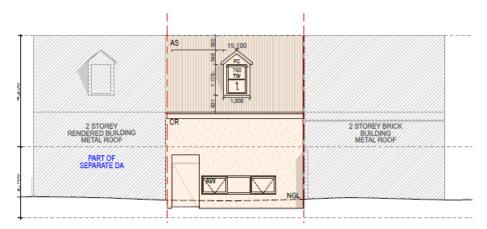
Internal elevation demonstrating sunken ground floor of the new building
